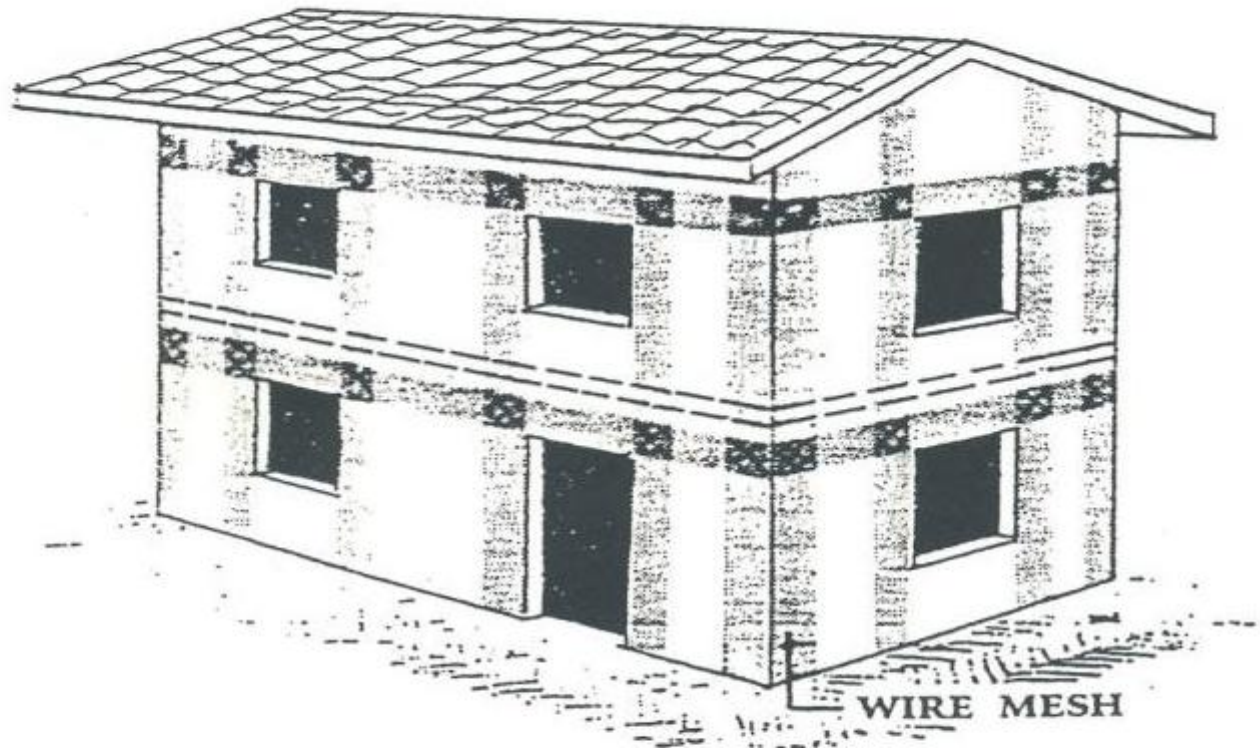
Recommendation regarding openings in bearing walls [1]
